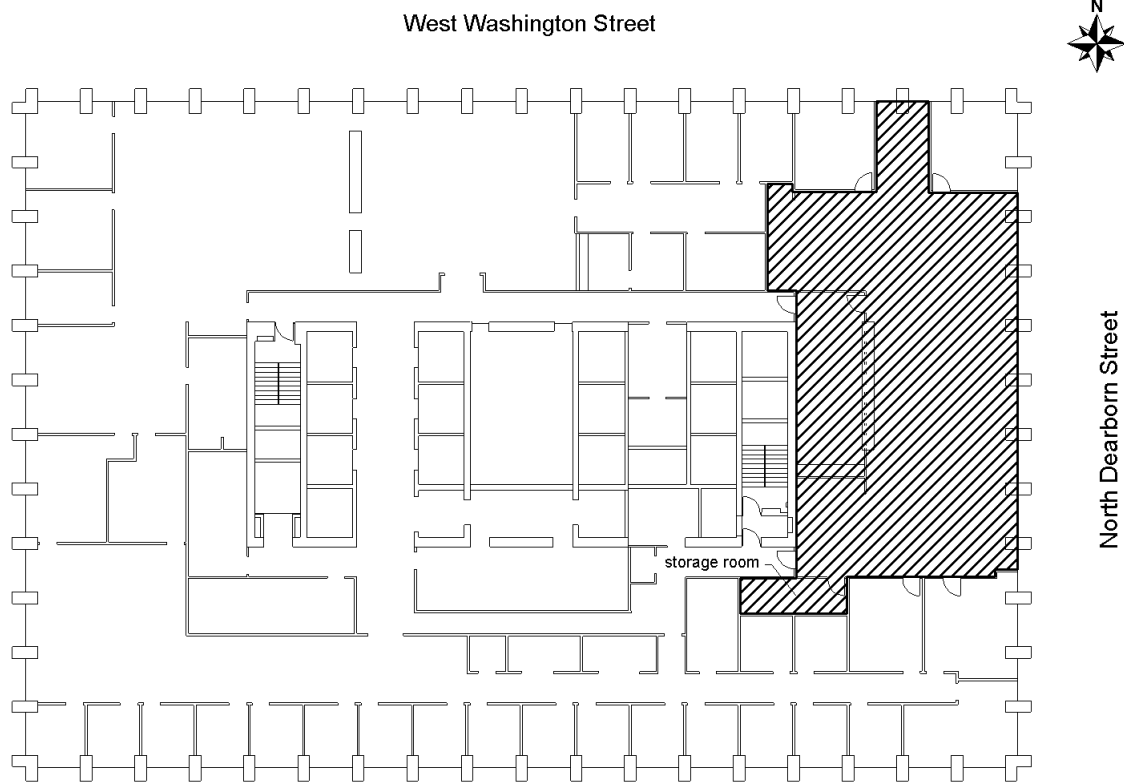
Plan view of 12th floor, showing area of significant fire damage
